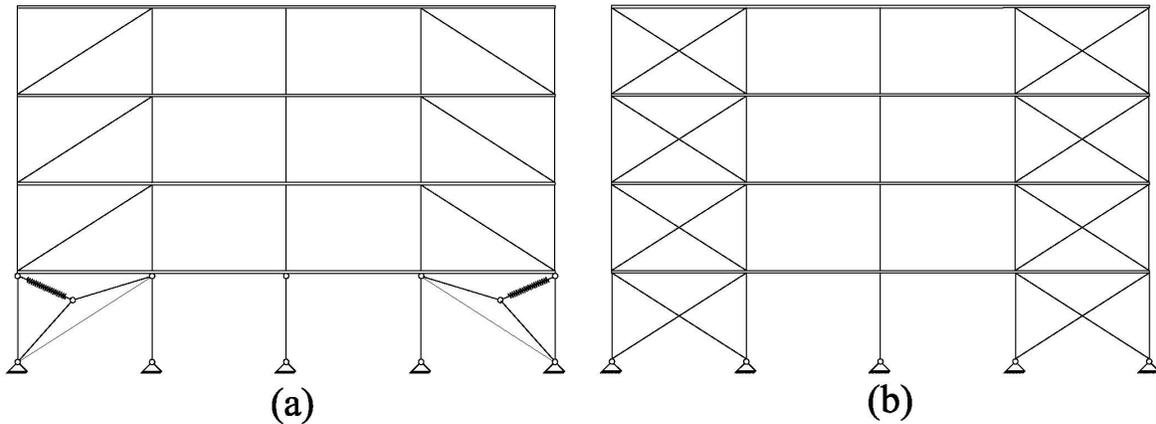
Typical bracing configuration (a) Off-center bracing (b) X-bracing
